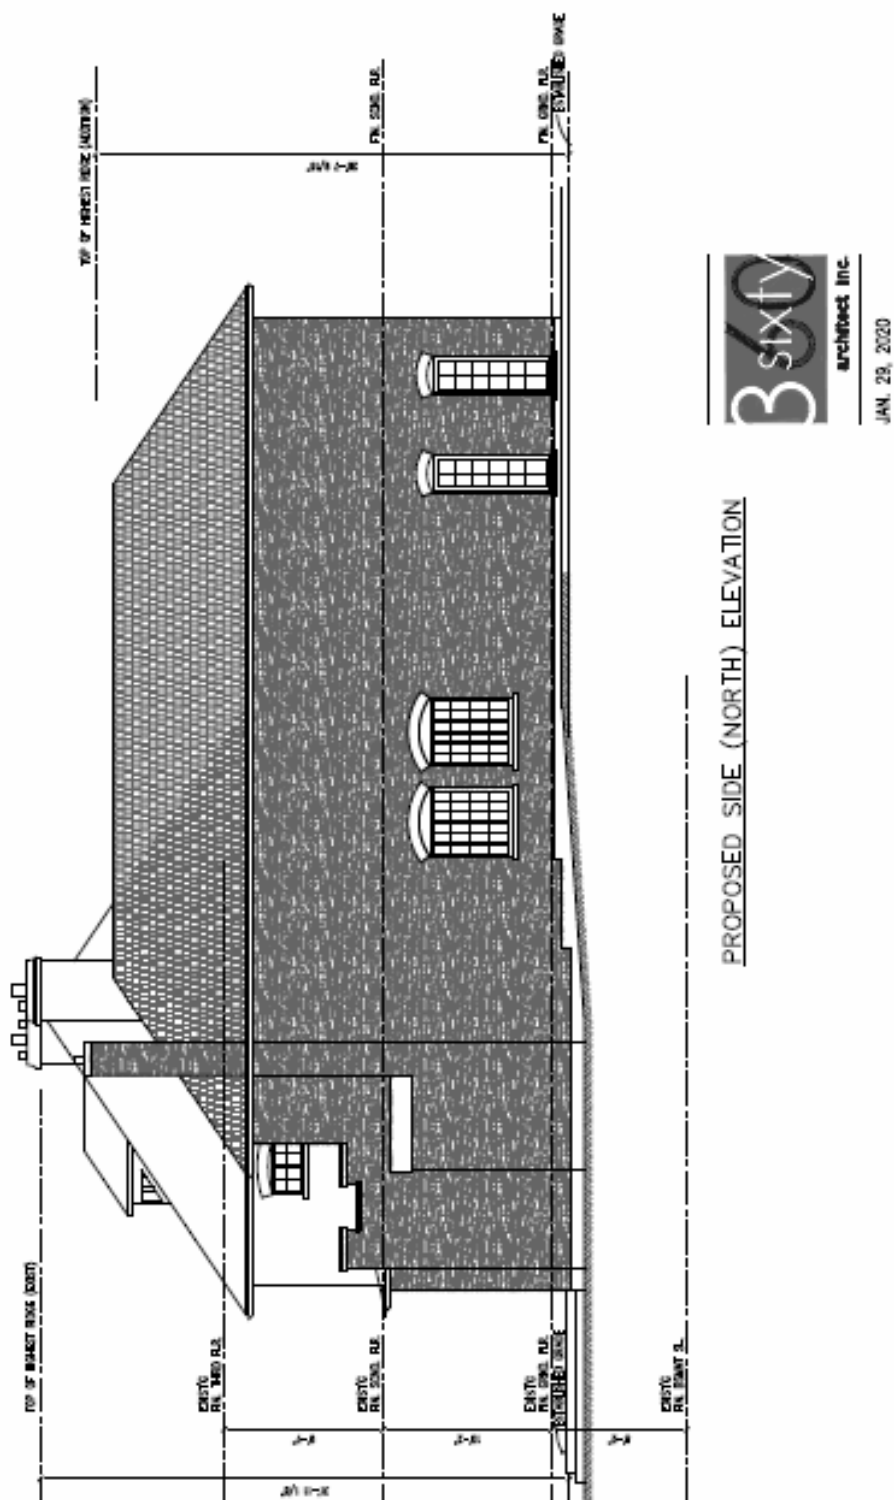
The north or side elevation of 1341 Stavebank Road with proposed addition.
